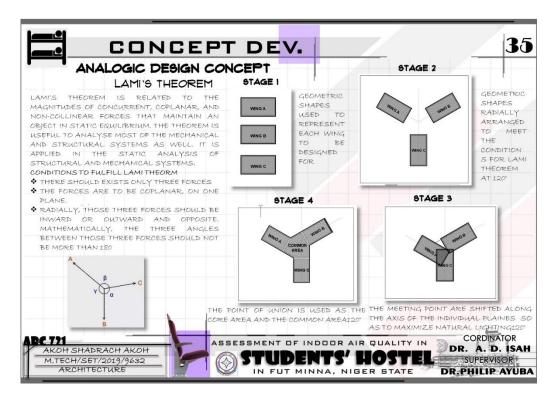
An architectural illustration of the building concept. Source: Author's field work (2023)
